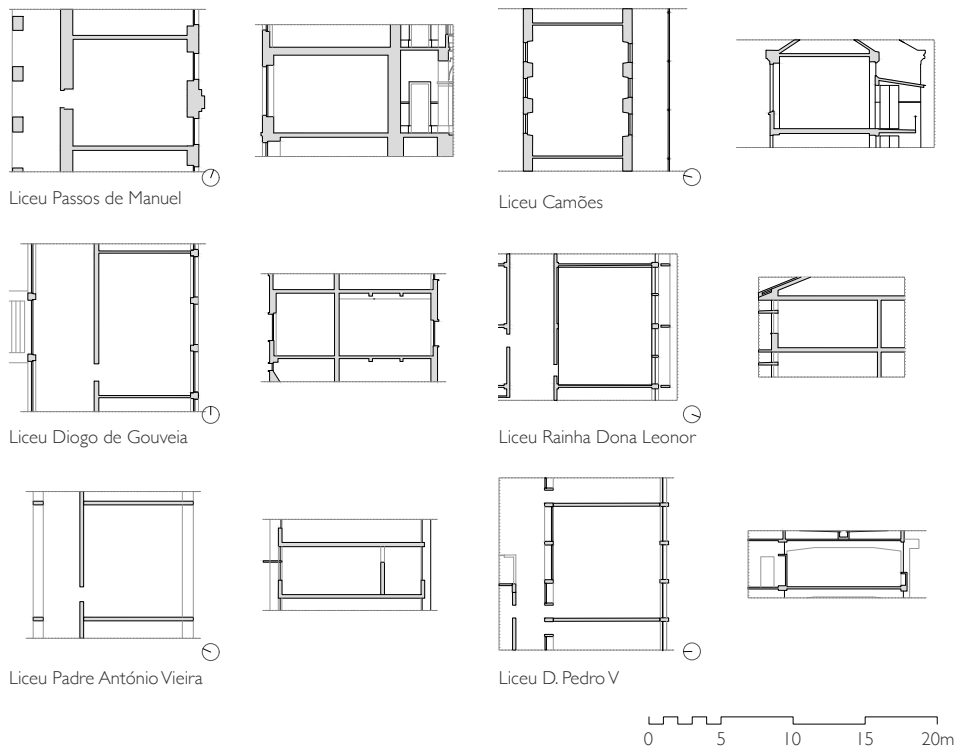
Floor plan and cross section of a classroom of the schools presented.
